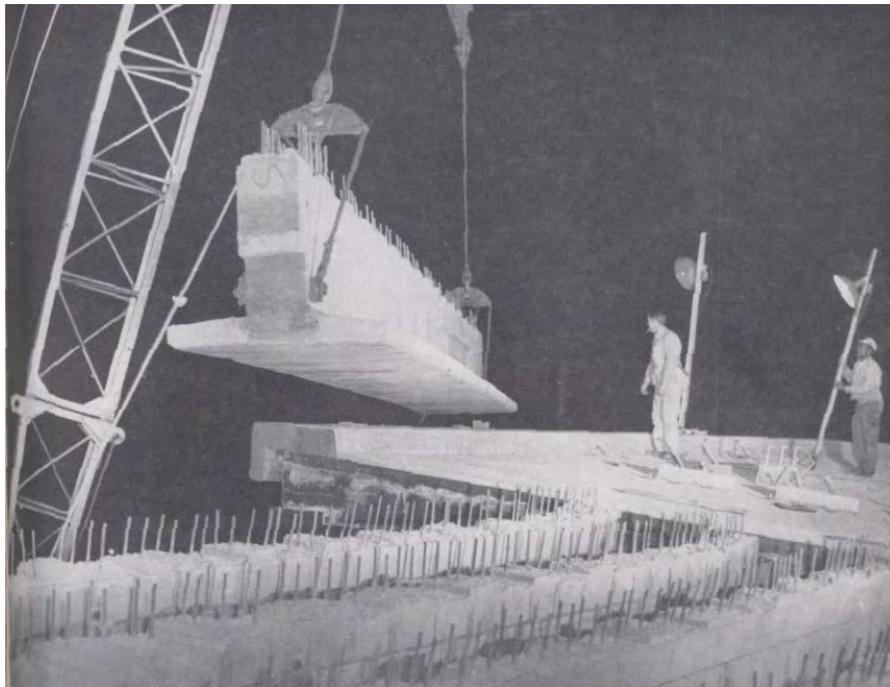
Placing inverted tee beam prestressed girder, San Bernardino-Santa Ana Freeway Interchange, 1955.
